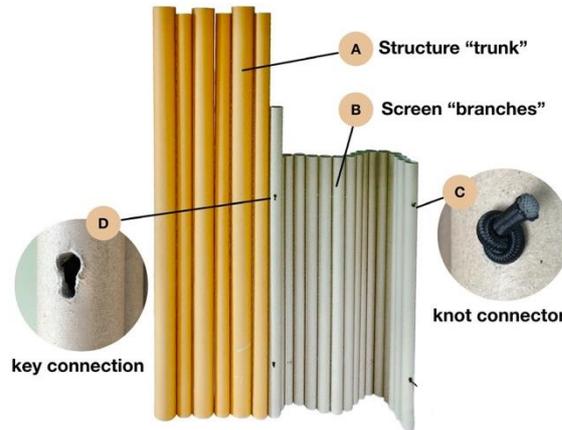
Flexible Screen system; Structural trunk, branches screen, knot connector, and keyhole connection
